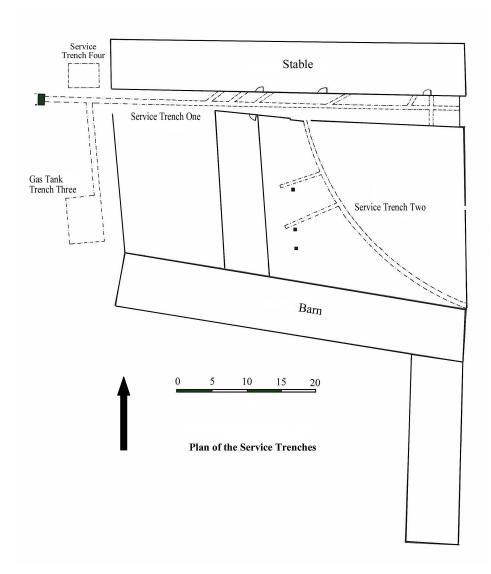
Location plan of service trenches in the fold yard and to the west of the stable and barn
